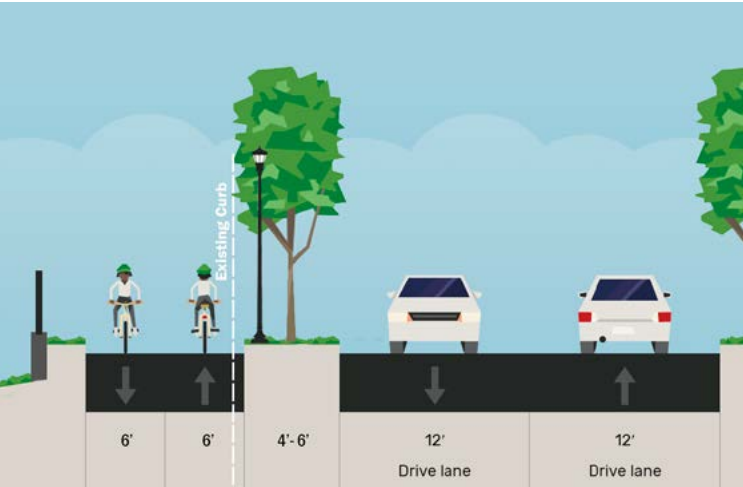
Segment 5 narrow right of way and retaining wall needs.
